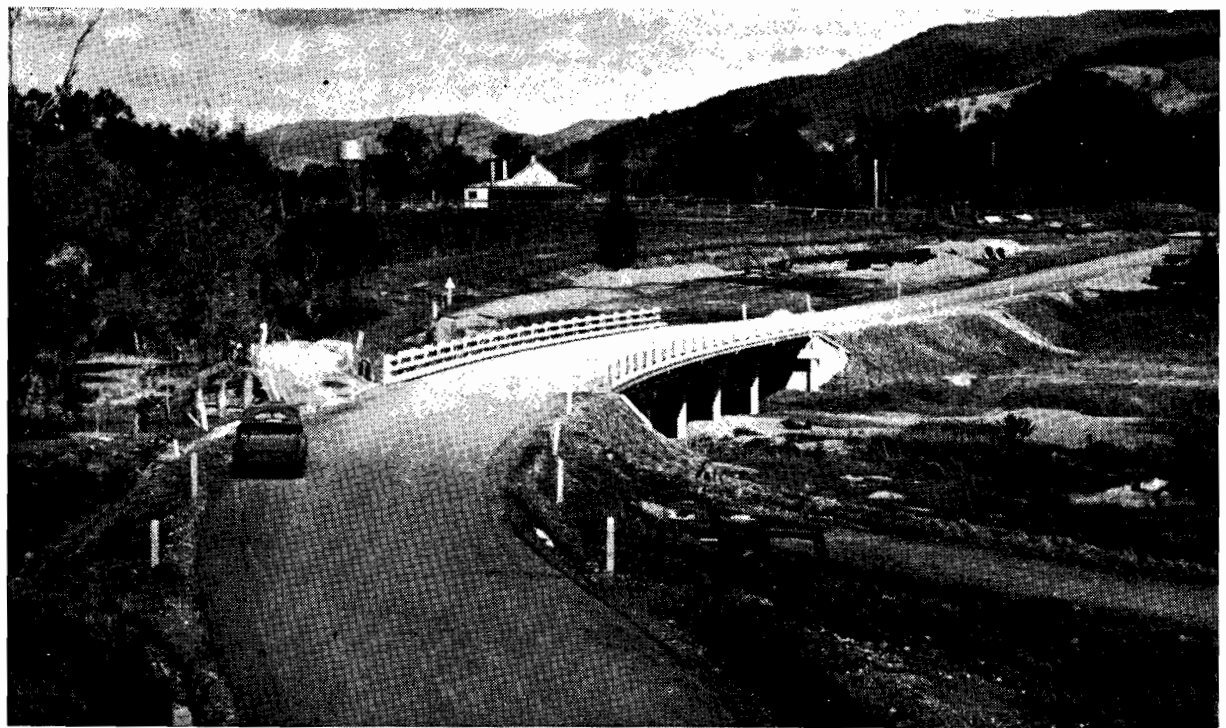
Kiewa Valley Road. Bridge over Yackandandah Creek replacing two weak narrow bridges and improving the alignment and visibility.
